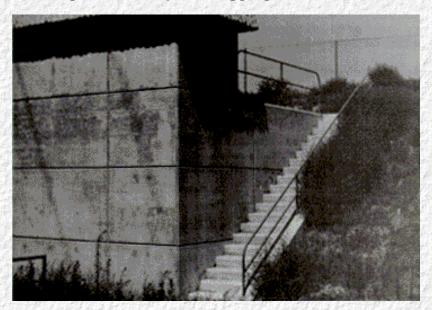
Architectural Concrete for Dry-Pit Pump Station
